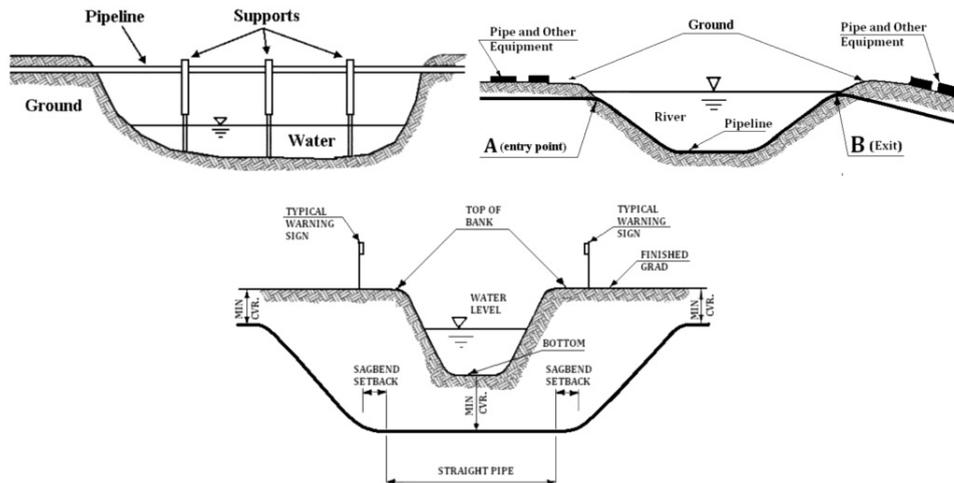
Crossing methods (a) Bridging with a support structure; (b) Laying into a trench on the bottom; (c) Drilling below the bottom.
